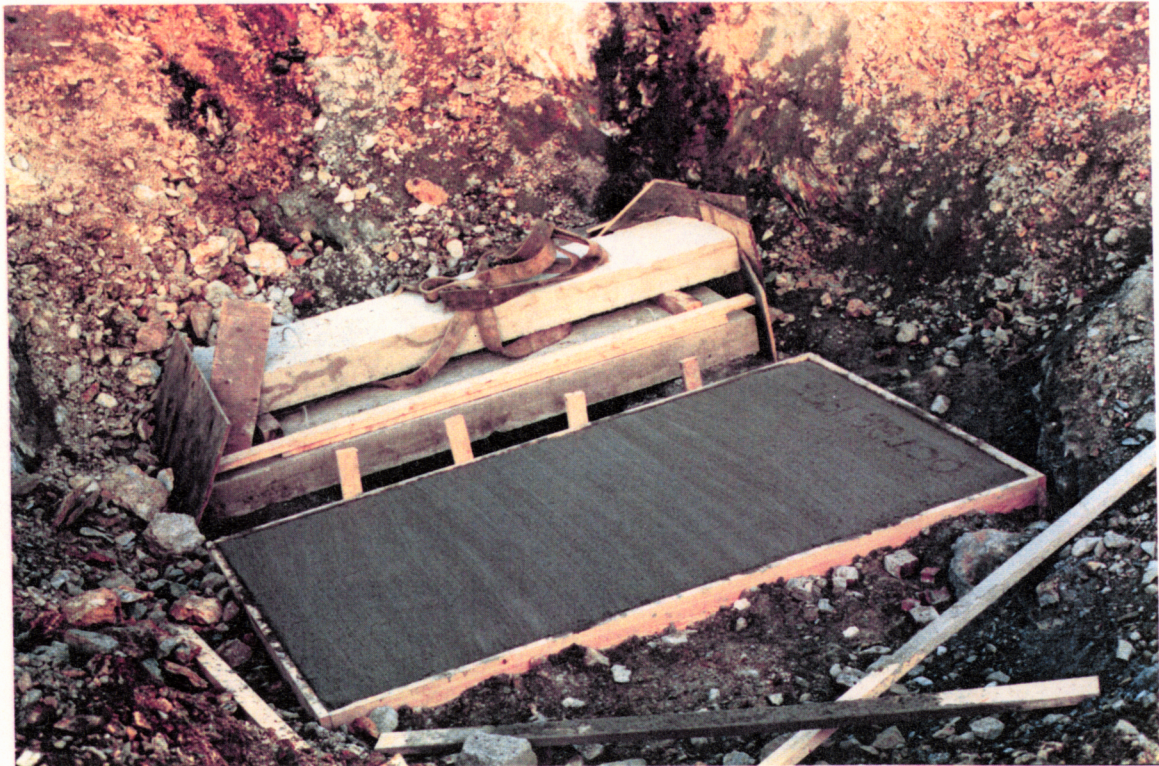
Cast-in-place concrete cap prior to removal of forms.
